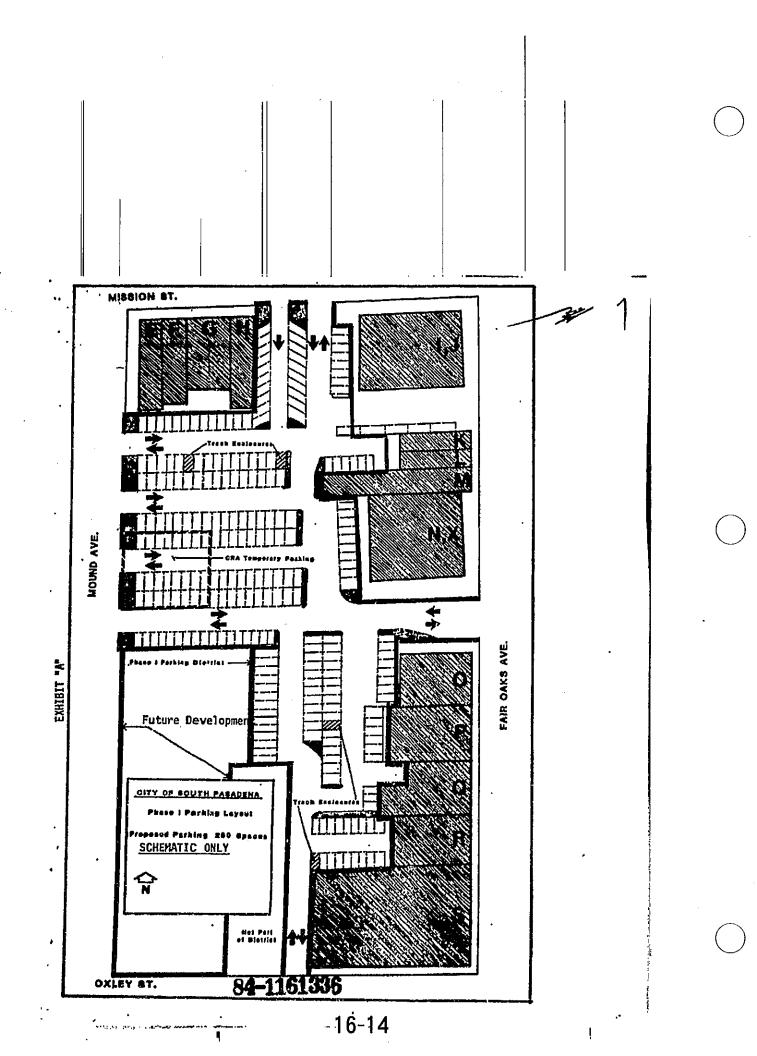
EXHIBIT "B" SOUTH PASADENA DOWNTOWN PARKING LOT
